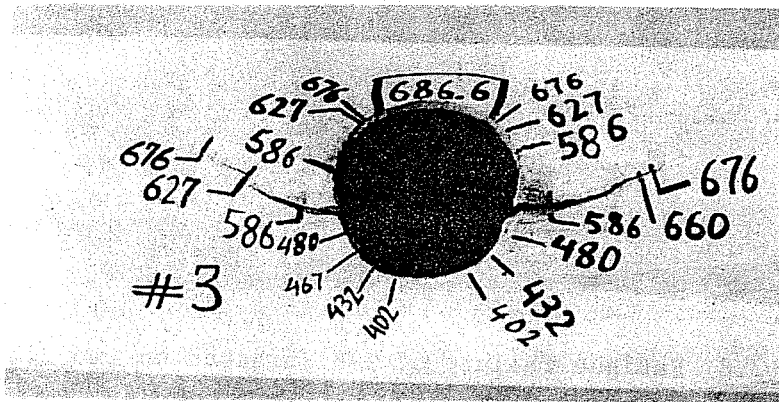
Fatigue failure of T-3 (cracked on one side)
